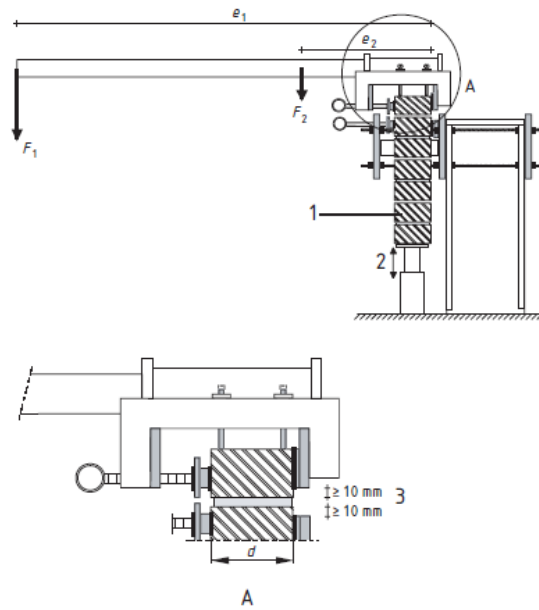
Layout of the bond-wrench test (EN 1052-5).
